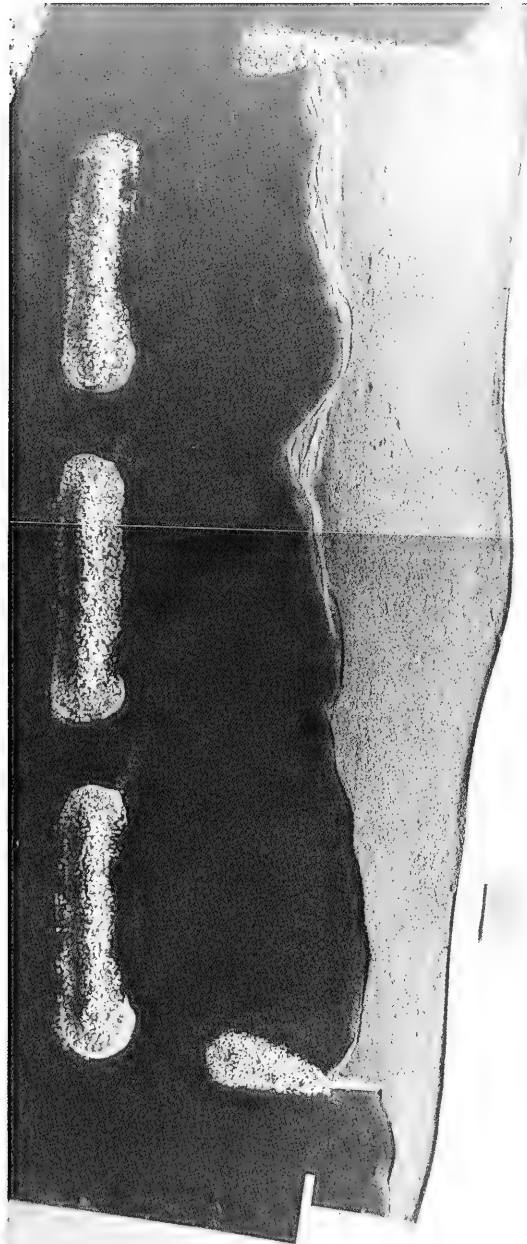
The recommended plan (30.5-m extension of the west groin toward the head of the west segment) at Lakeview Park
